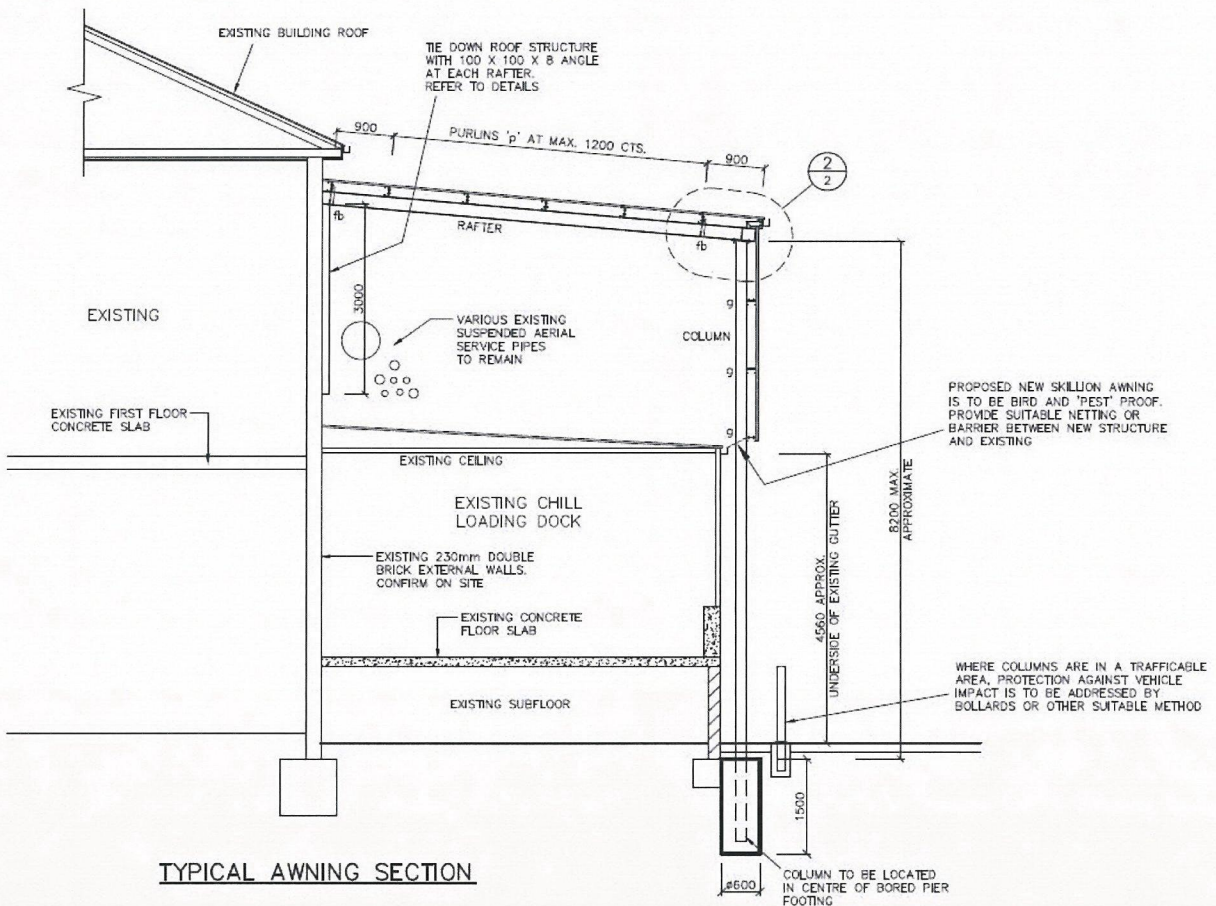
Section of the proposed awning (Source: Development plans prepared by Xeros Piccolo)
